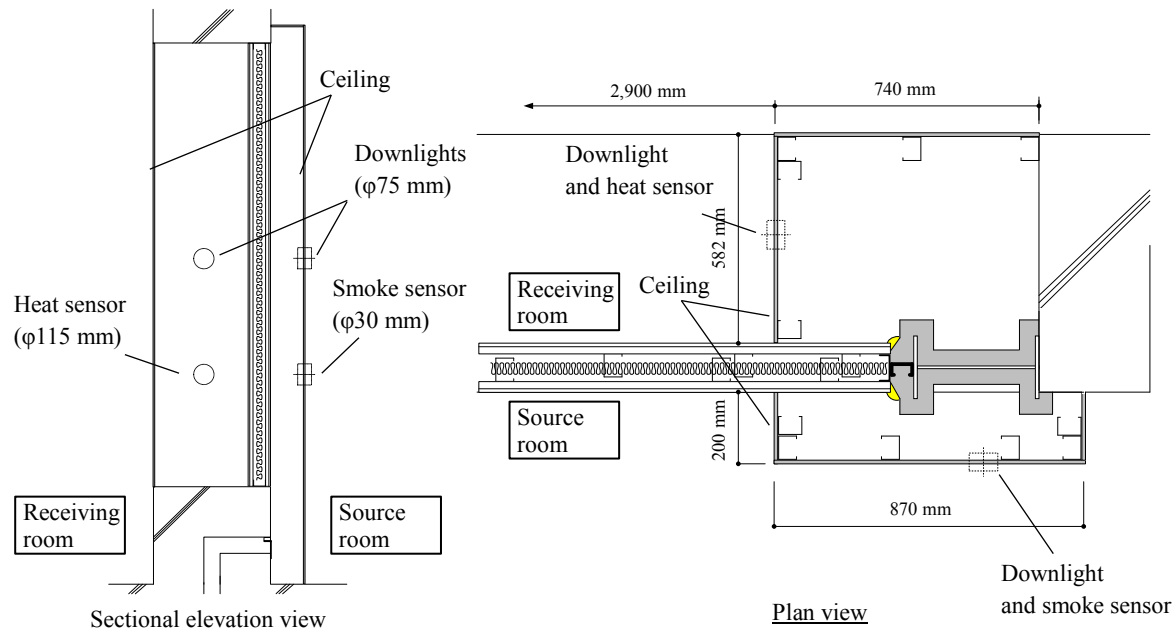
Installation method of the ceiling (For Specimens 3 and 4).
